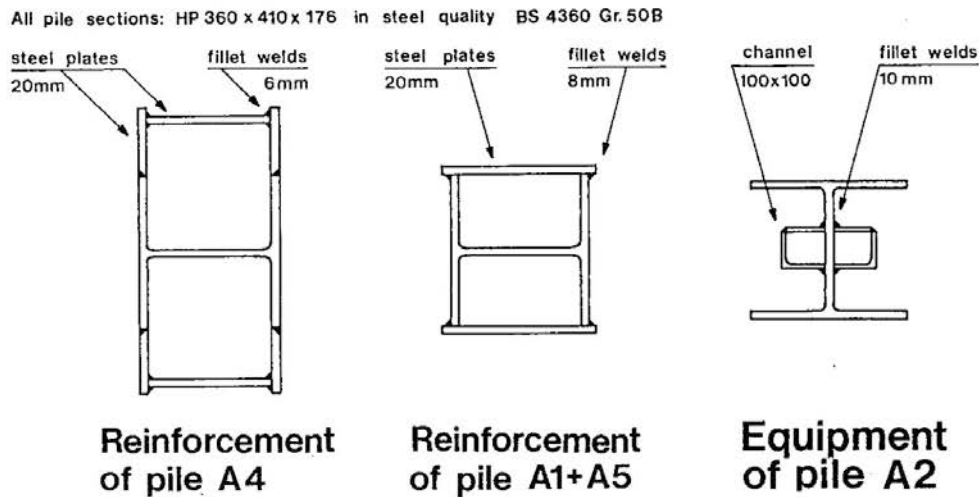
Details of reinforcement of piles A1, A2, A4, A5
